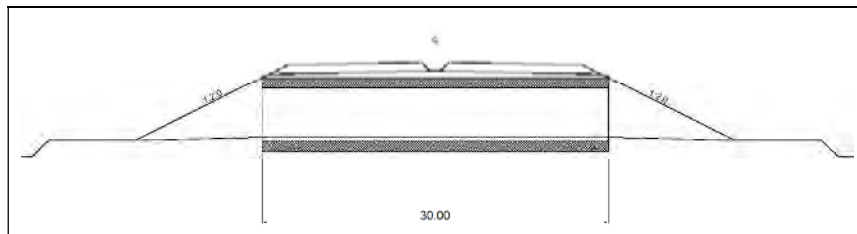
Cross Section at the Point Crossing Box Culvert
